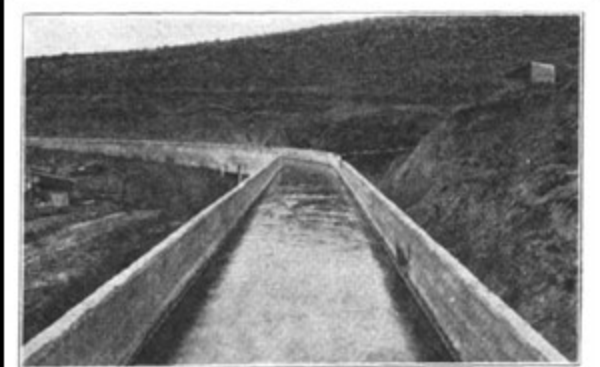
Section of Flume Leading from a Tunnel Into an Open Ditch.
